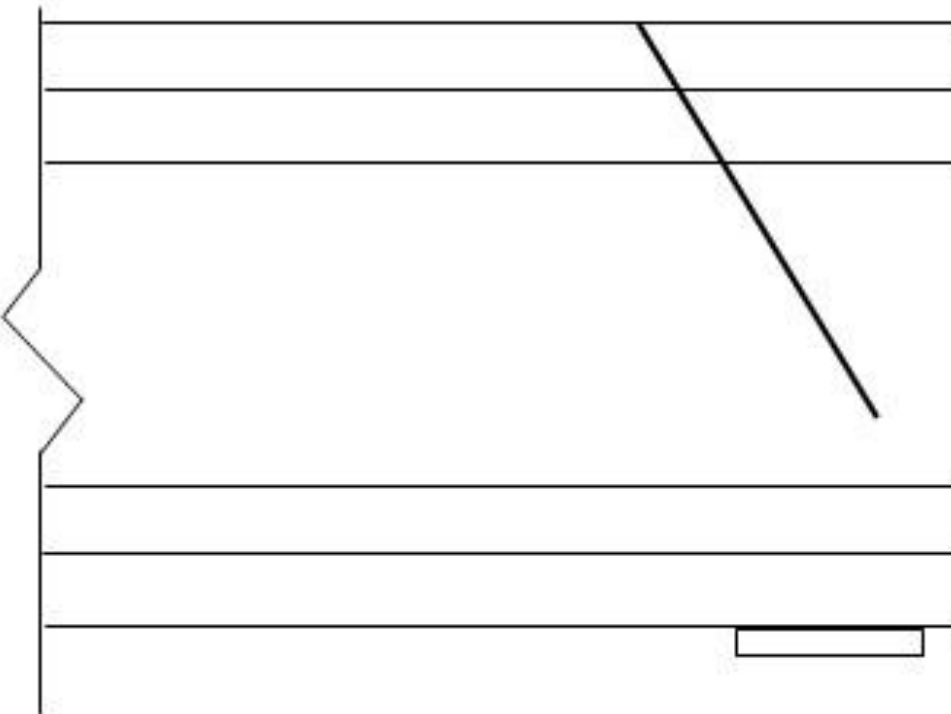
Crack diagram for exterior girder, west side, west face, south abutment (#1829).
